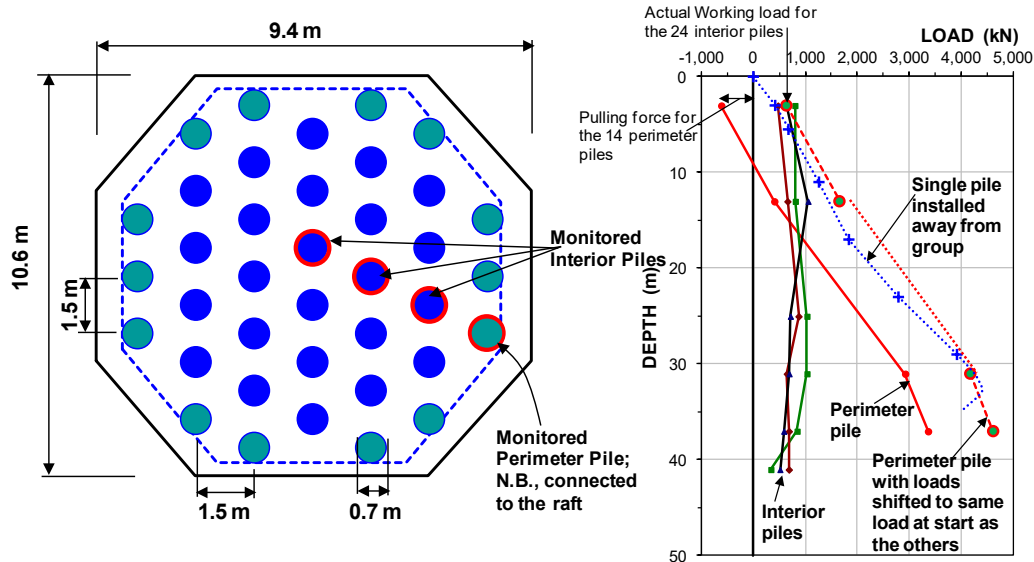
Layout of pile group and distribution of axial force in the four test piles and in a single test pile away from the group. (After Okabe 1977)
